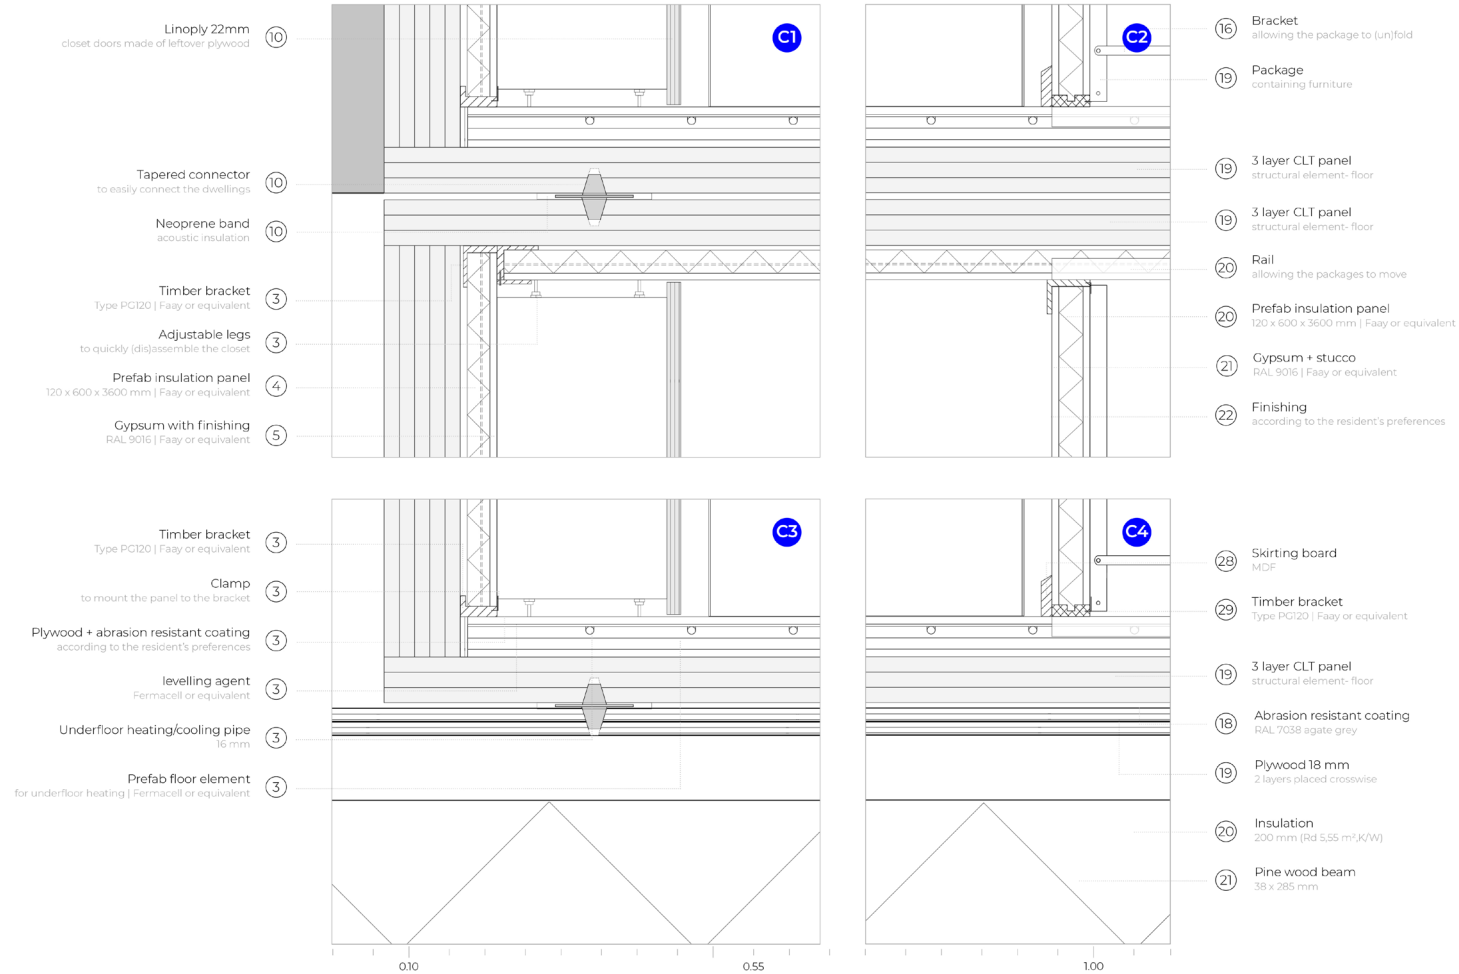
DETAIL DRAWINGS | VERTICAL SECTION B | SCALE 1:10
